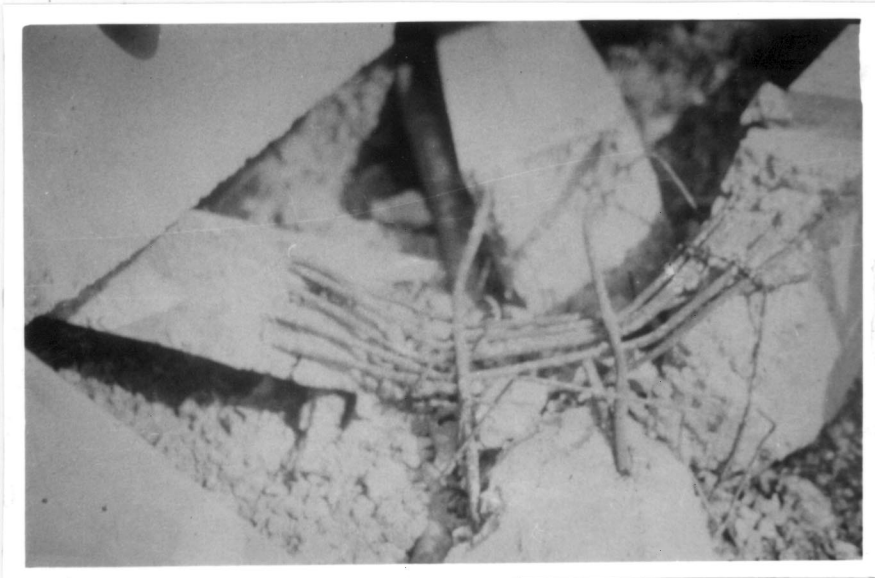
damage to school building due to long walls without columns & horizontal bands
